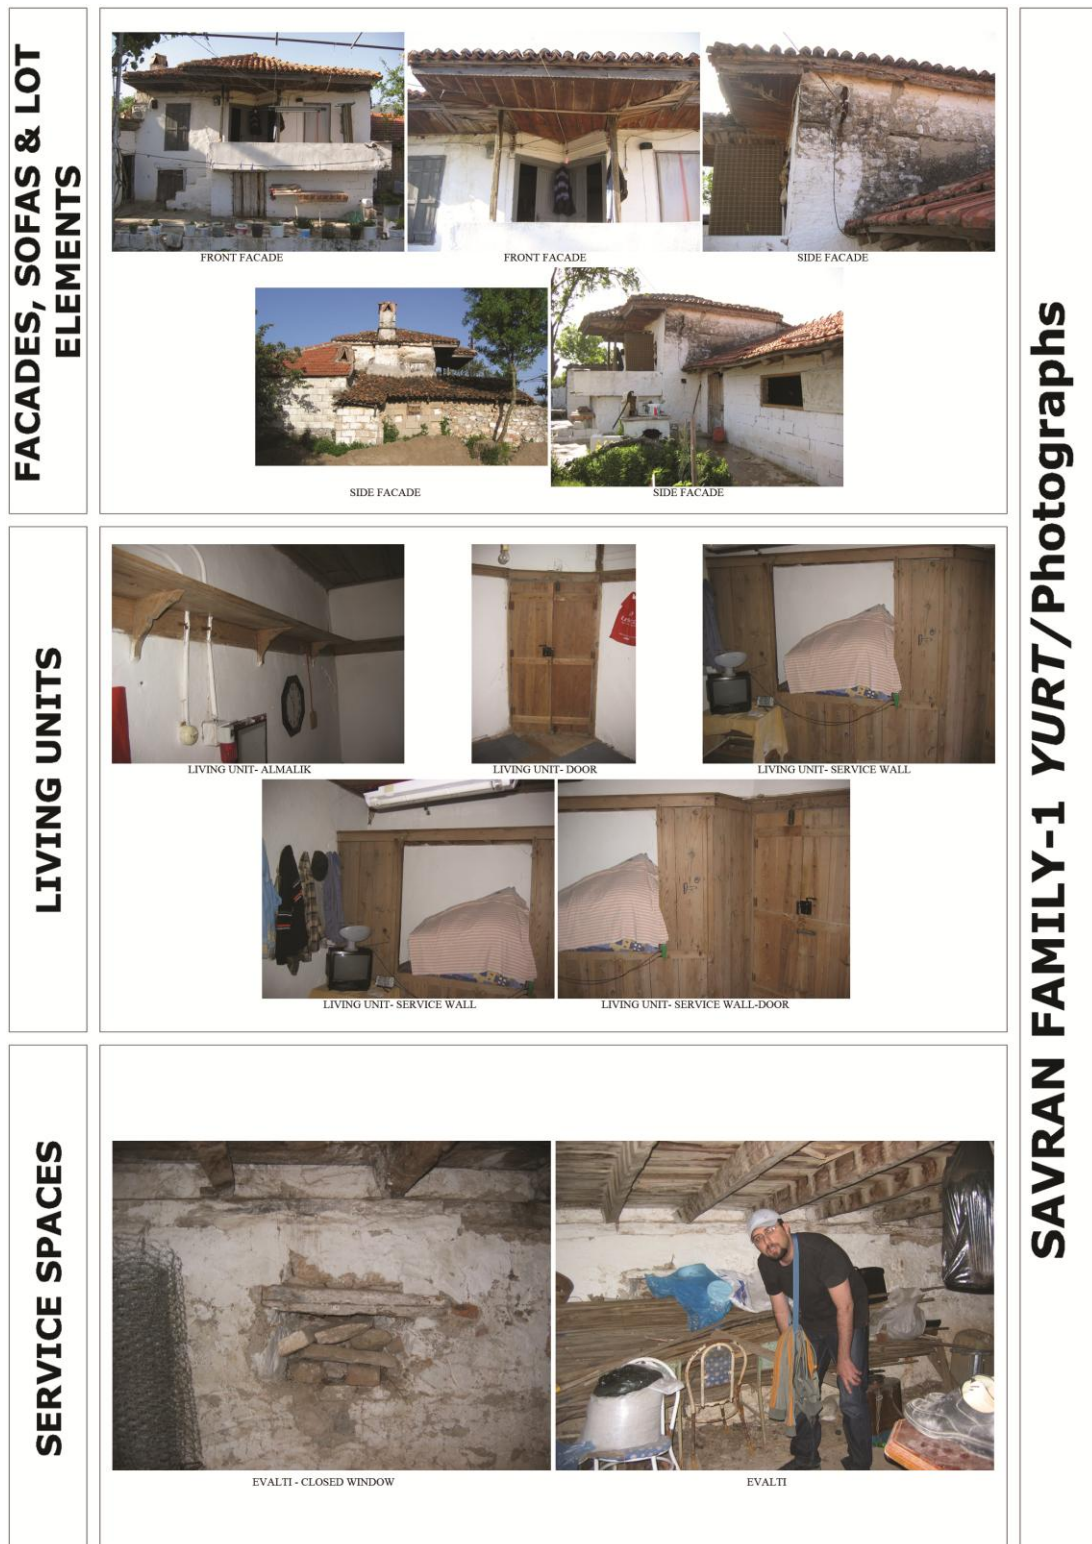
Photographs of the traditional building in the *yurt* of Savran-1 Family
